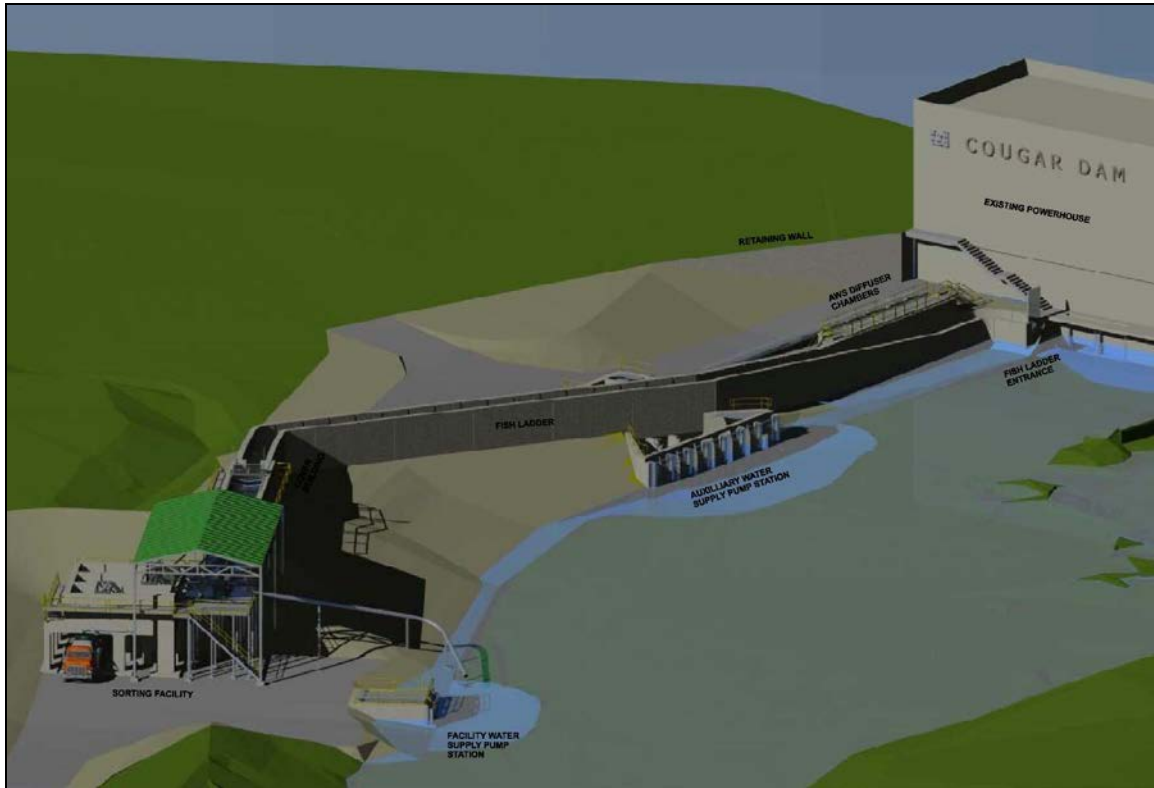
Adult fish collection facility at Cougar Dam in Oregon (Courtesy of USACE)
